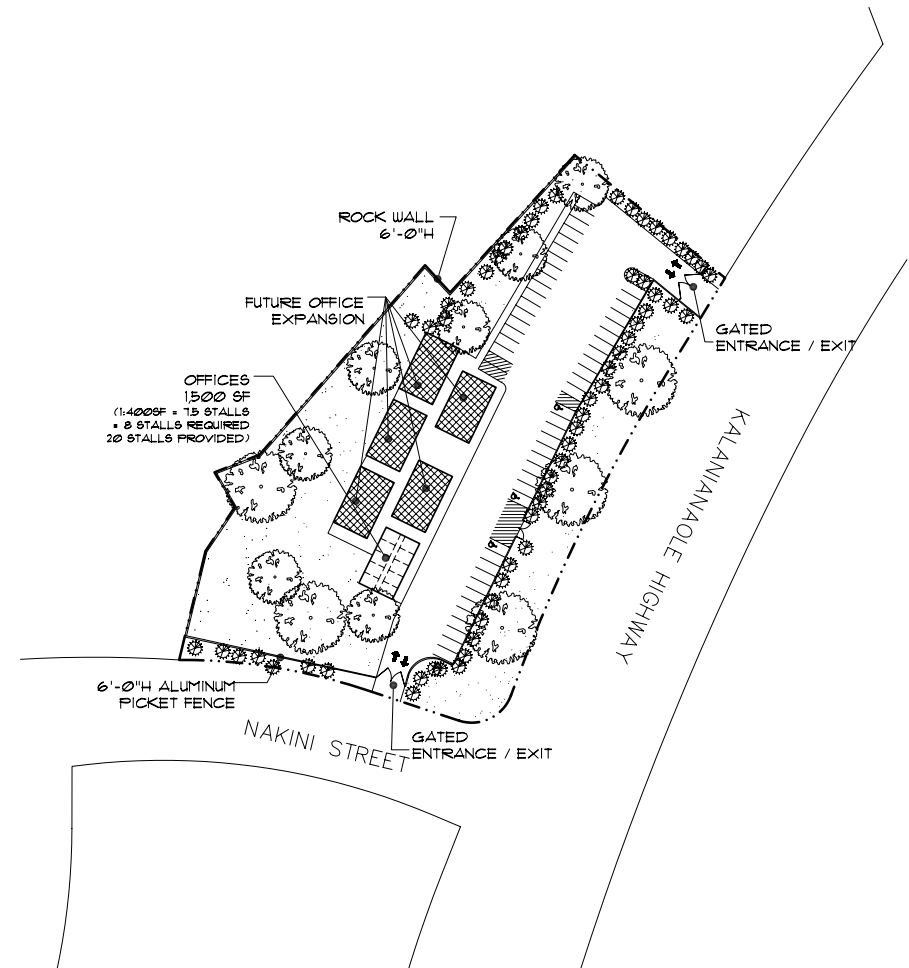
QUARRY SITE PLAN - CONCEPTUAL
